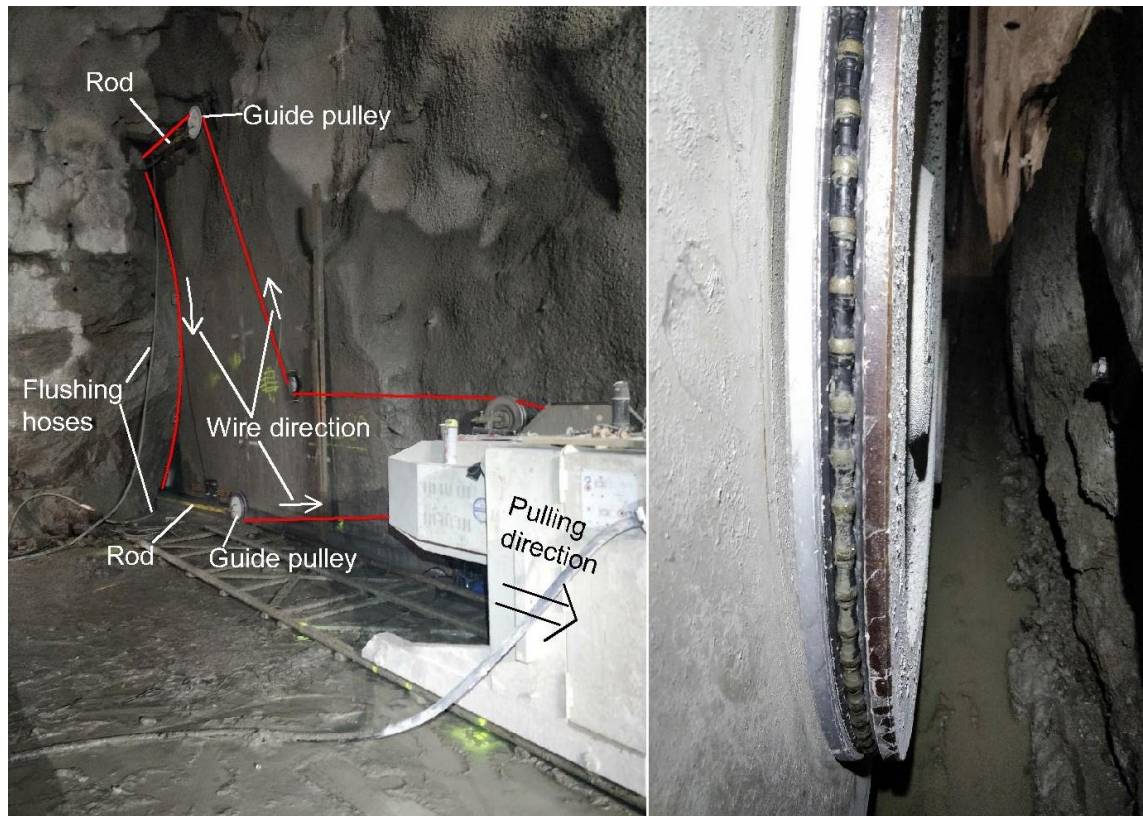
Installed equipment for cutting the right side wall. Cable lines highlighted for demonstration purposes. The picture on the right shows the mounted wire on the drive pulley of the machine.
